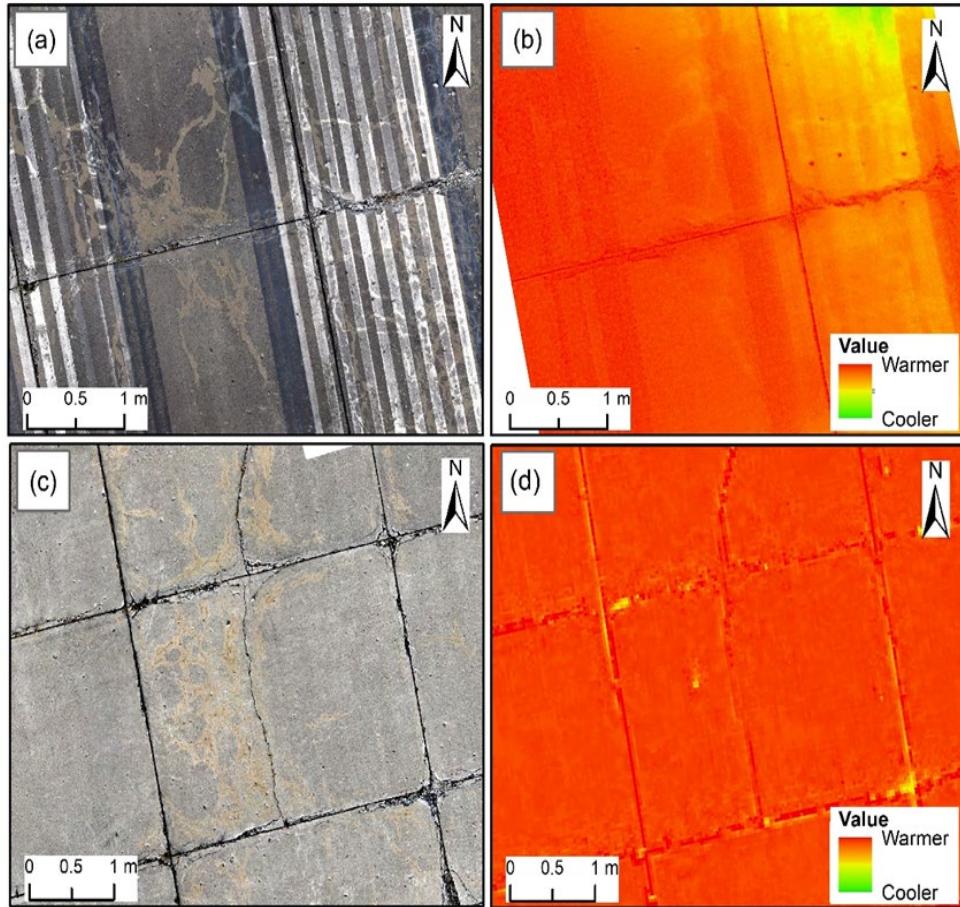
Longitudinal, Transverse, and Diagonal Cracks and Diagonal Cracks on PCC Pavement in Runway 17/35, Section 20 at ONZ: (a) 1.5-mm/pix Orthophoto of Sample Unit 5, (b) 8-mm/pix Stereo Thermal of Sample Unit 5, (c) 1.5-mm/pix Orthophoto of Sample Unit 23, and (d) 31-mm/pix Stereo Thermal of Sample Unit 23
